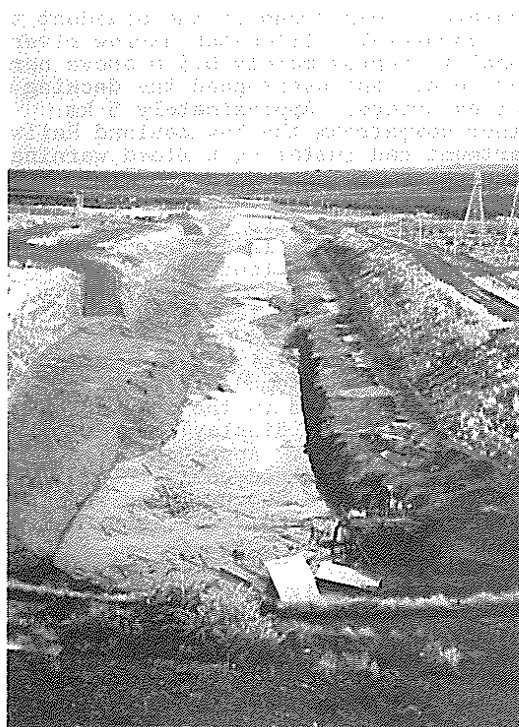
View looking west along Wahianoa aqueduct showing level of lahar, and flooded tunnel portal in foreground.
